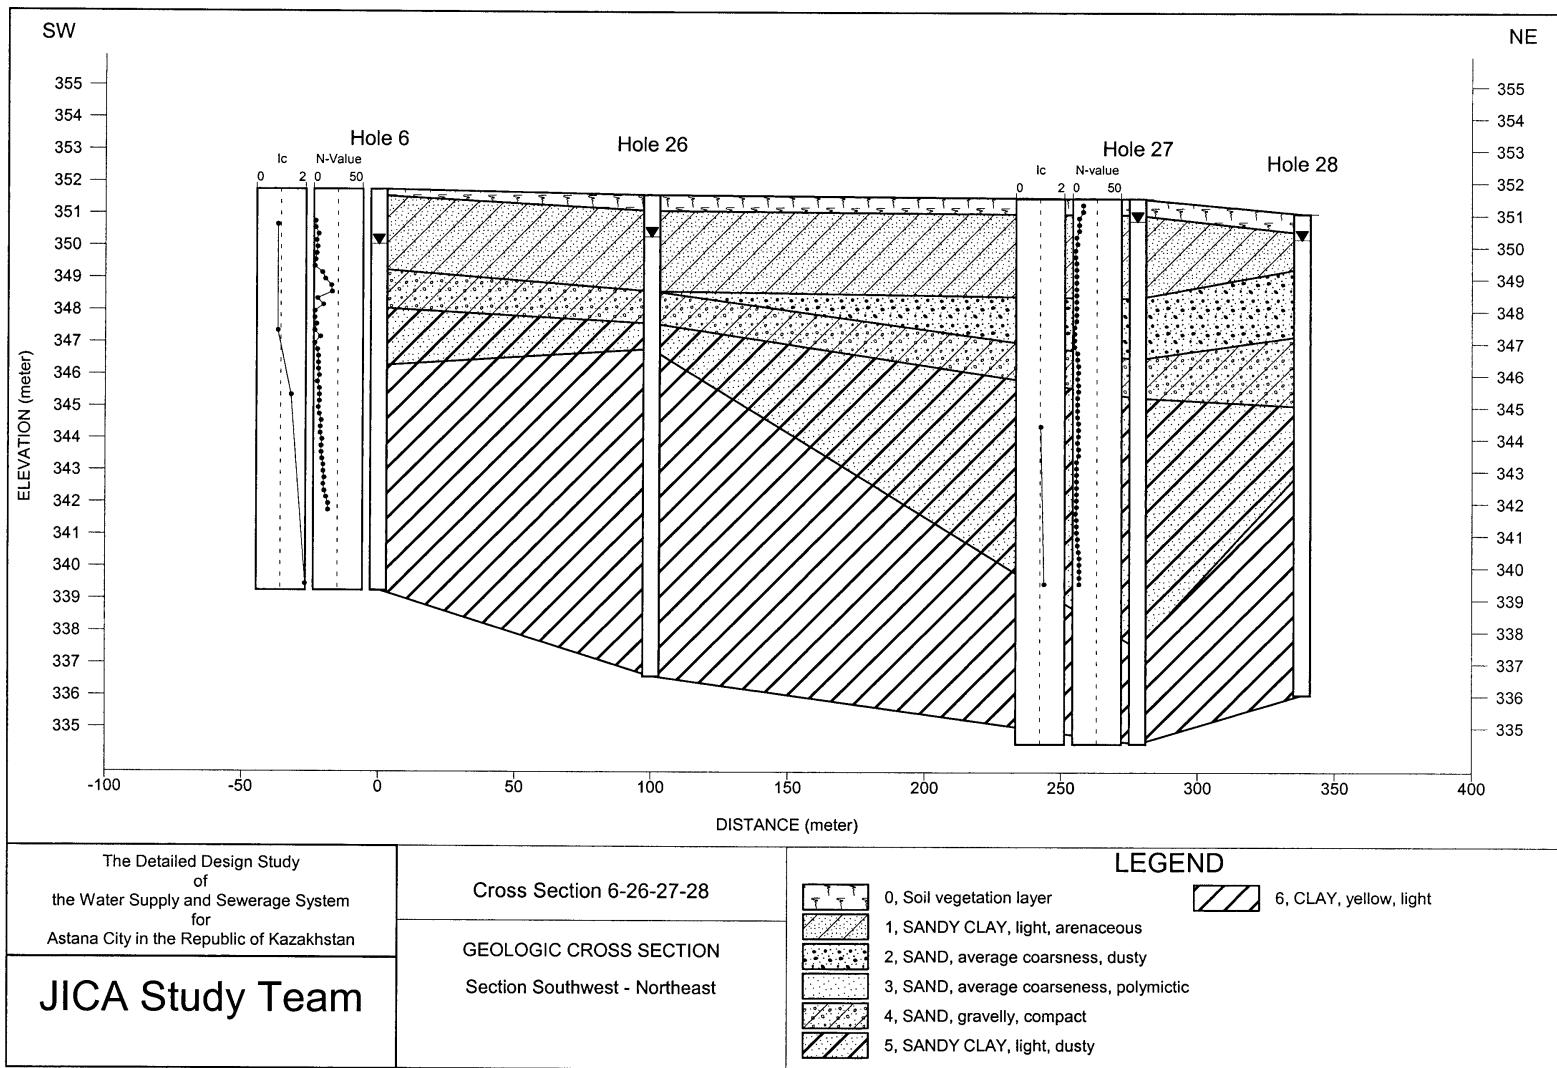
(2) Geological Cross Section at Water Treatment Plant (2/9, Line No. 6-26-27-28)
